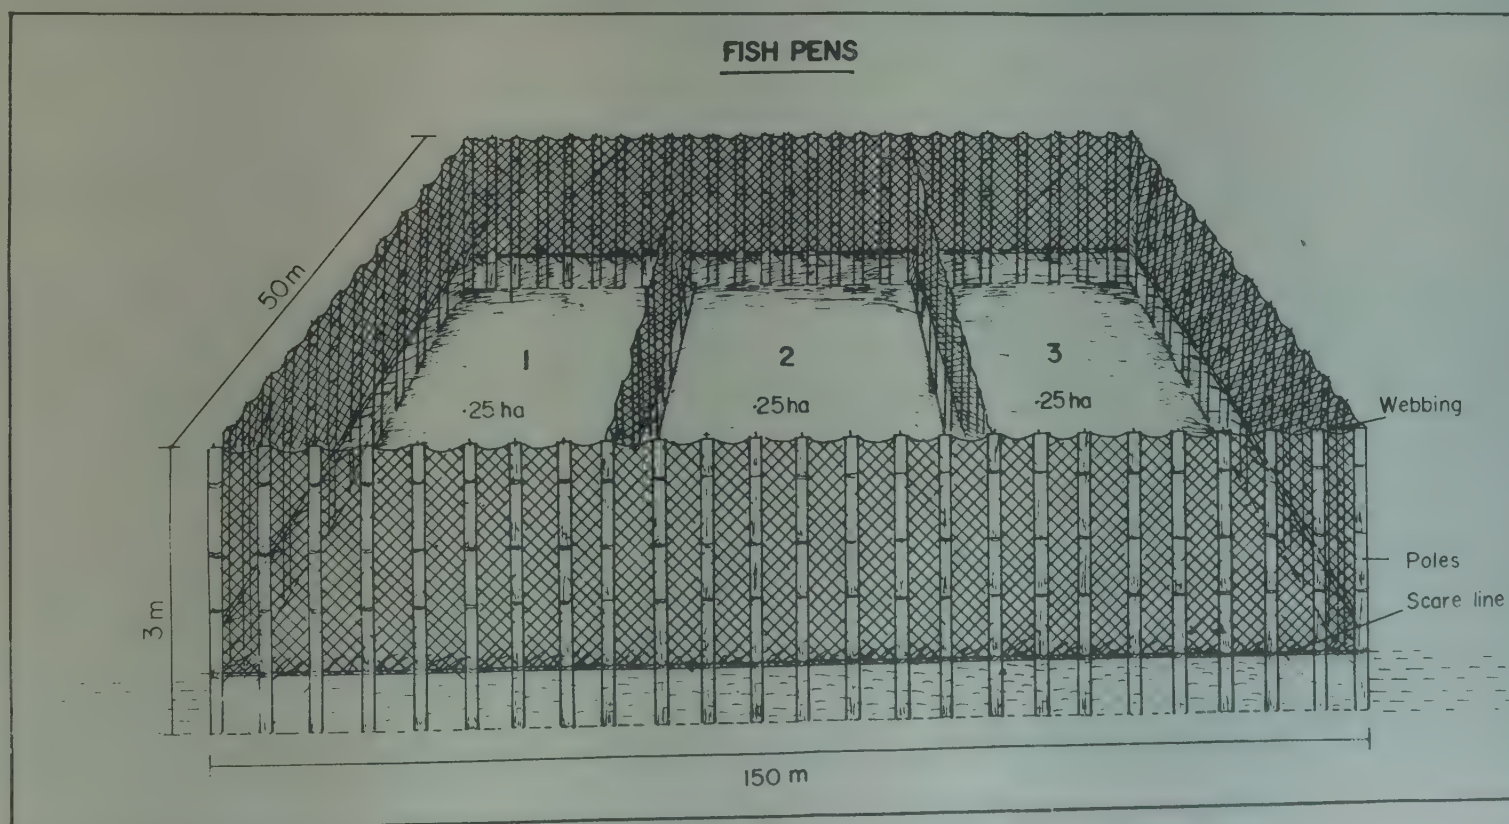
Three fish pens constructed in Pillaimadam lagoon
